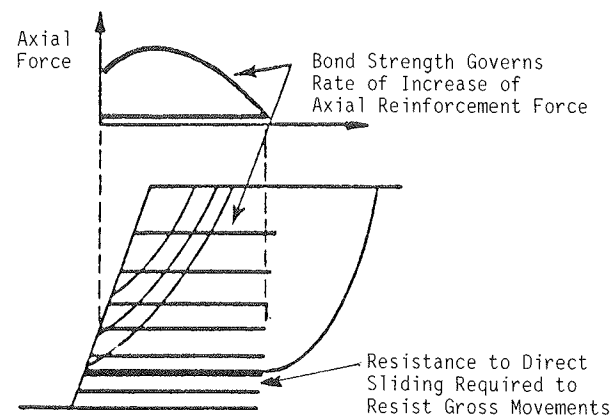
Two mechanisms of failure in a reinforced soil embankment. [Jewell et al., 1984a]
